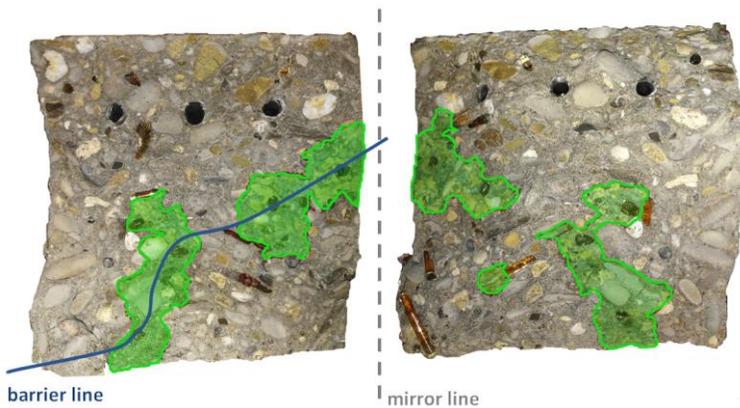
split cracked plane of a concrete specimen containing 36 pressurized capsules per litre, where healed areas (in green) formed a barrier against water flow.
